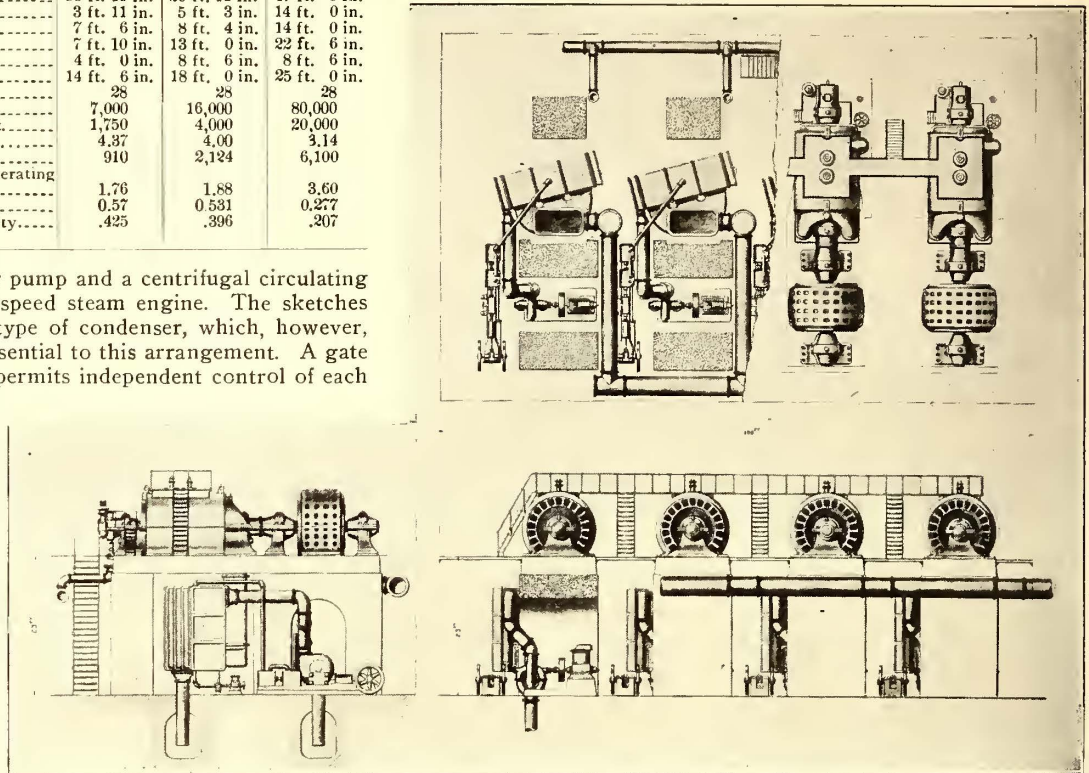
TYPICAL TURBINE PLANT ARRANGEMENT. FOUR 400-KW UNITS
